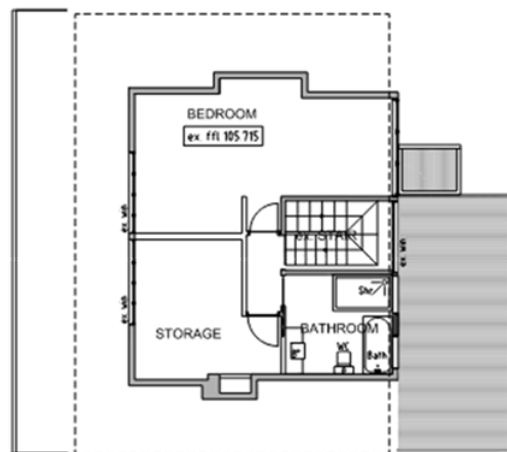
existing/proposed floor plan – basement (will remain as an office)
